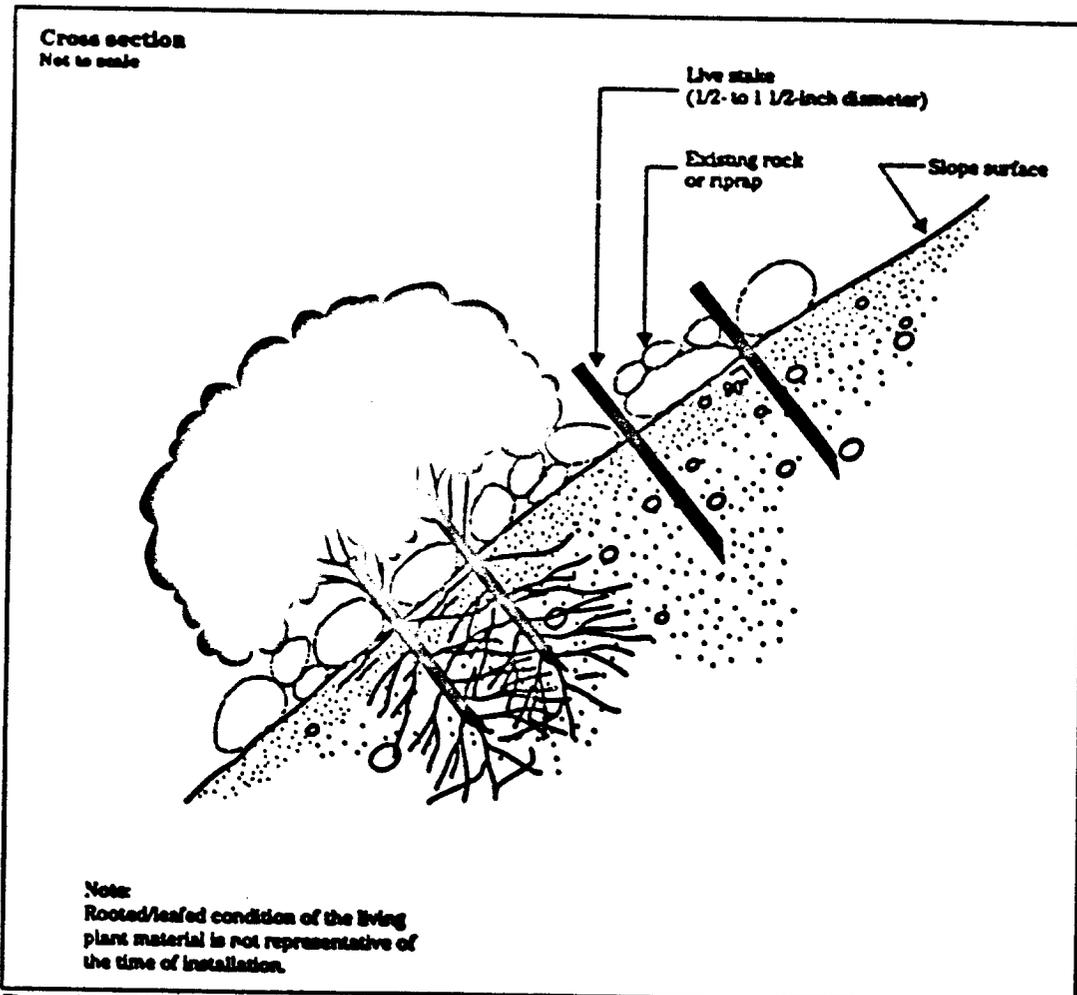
Schematic cross section of a joint planting system showing important design elements (USDA-SCS, 1992).
